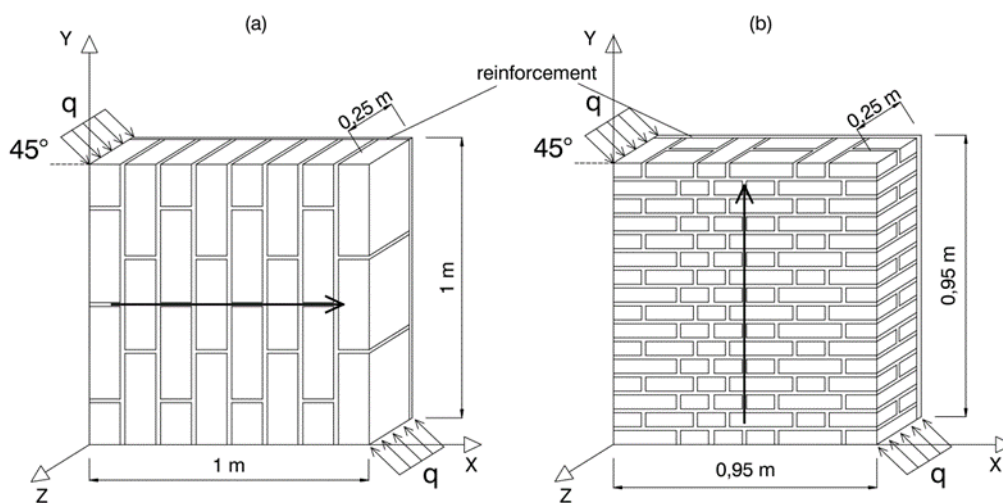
Tuff (a) and bricks (b) laboratory panels
